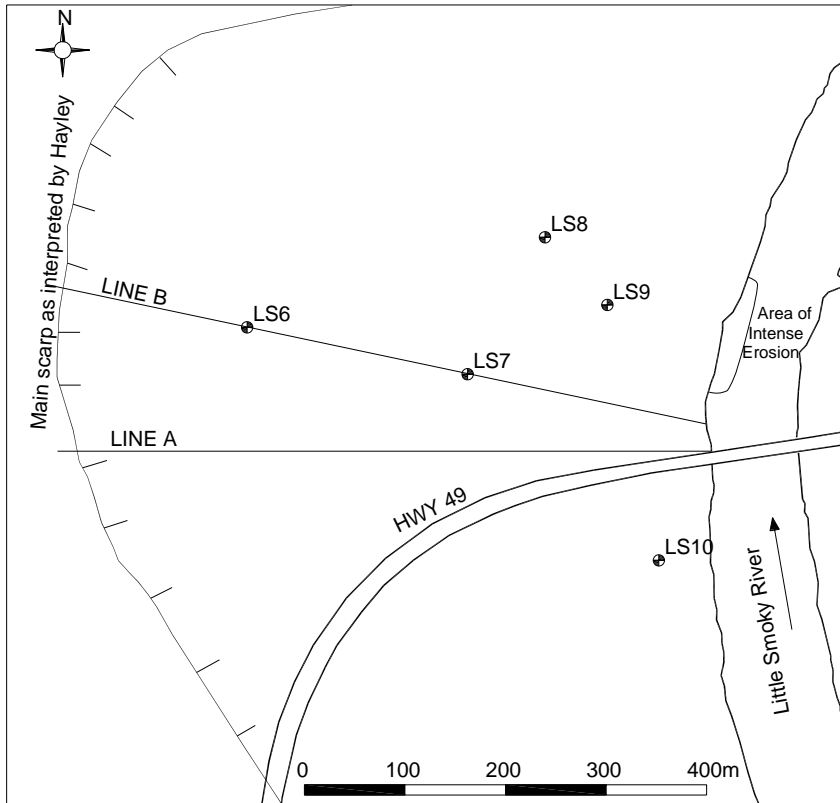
A Plan Showing the Instrumentation Used for Monitoring the West Slope in the Late Sixties (Modified after Hayley, 1968)
